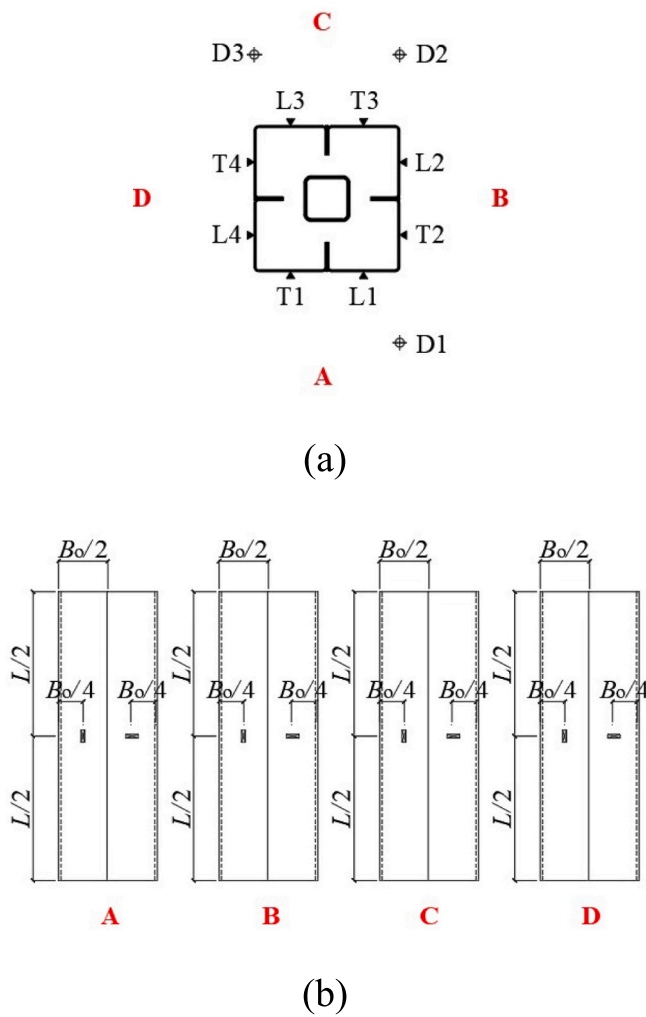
Locations of the strain gauges on the specimens including a (a) plan and (b) elevation view.
